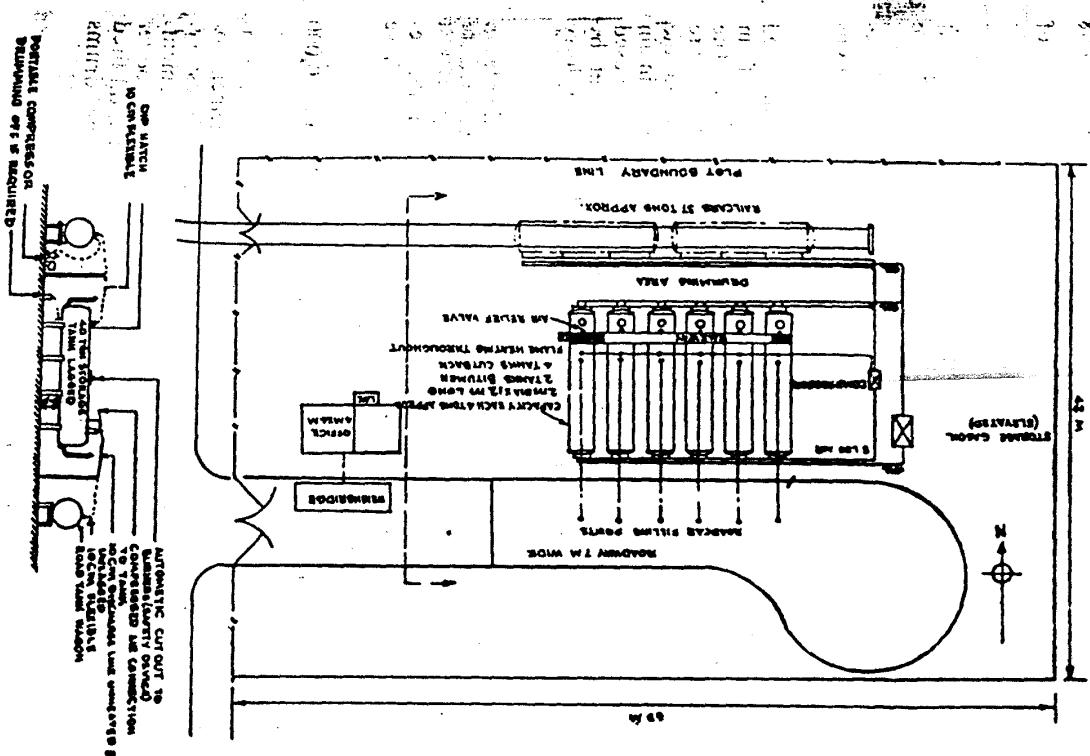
Typical layout of bulk bitumen storing site (Example 1)
